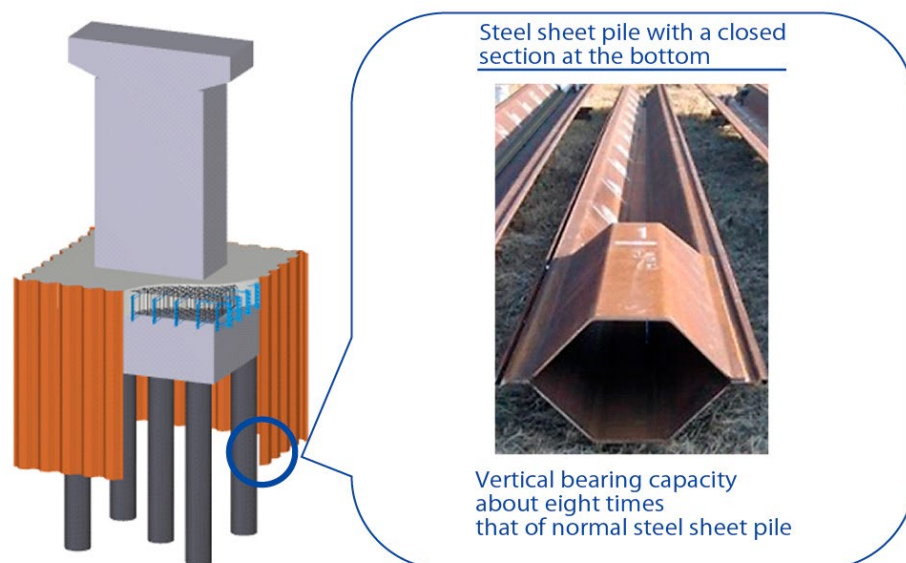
Liquefaction countermeasure technical method for existing pile foundations using steel sheet piles with a closed section at the bottom
